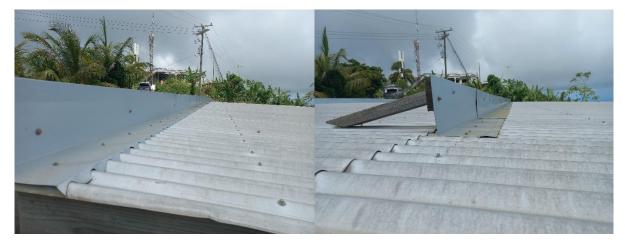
Photos showing "L" shaped rain stops installed to prevent rainwater flying away
